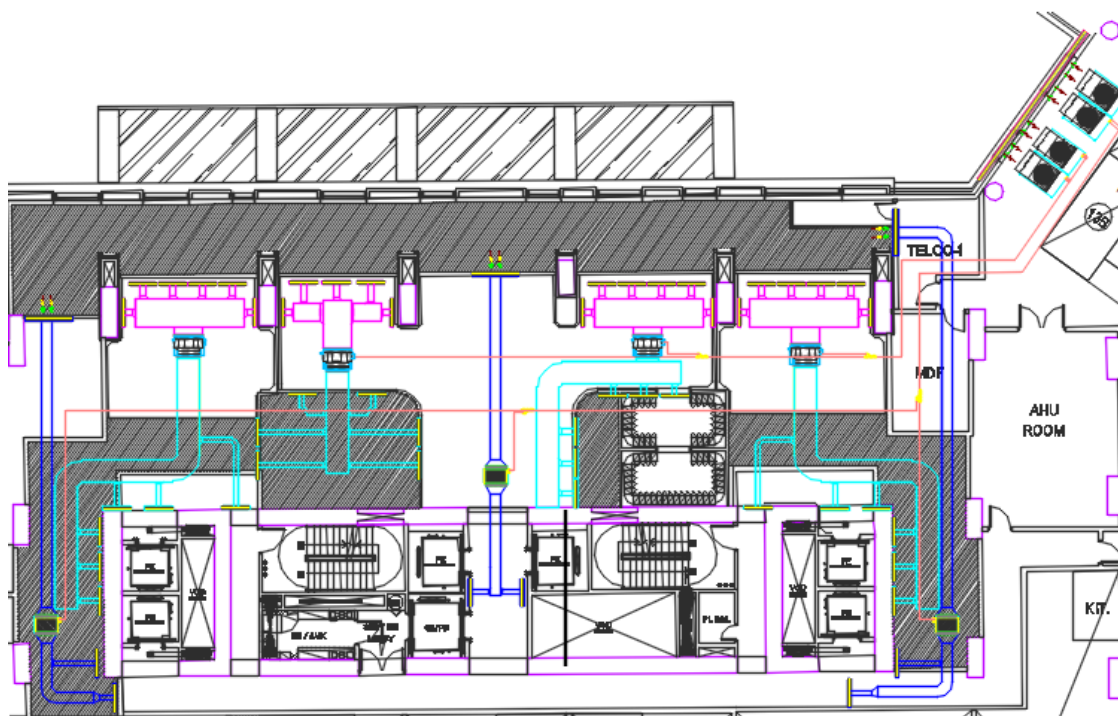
Layout for Option 1 at Mezzanine of Ground Floor
